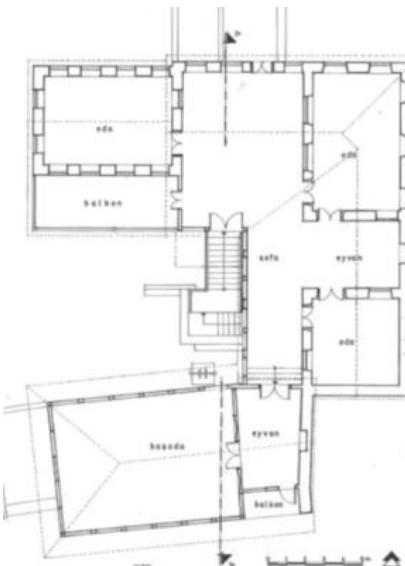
Derviş Paşa Mansion, Second Floor Plan
